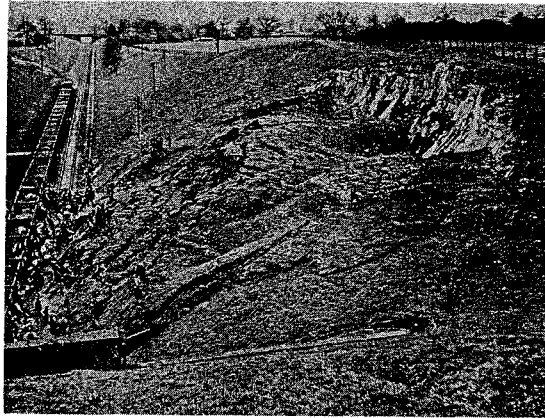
Photograph of slide in very stiff fissured clay.
